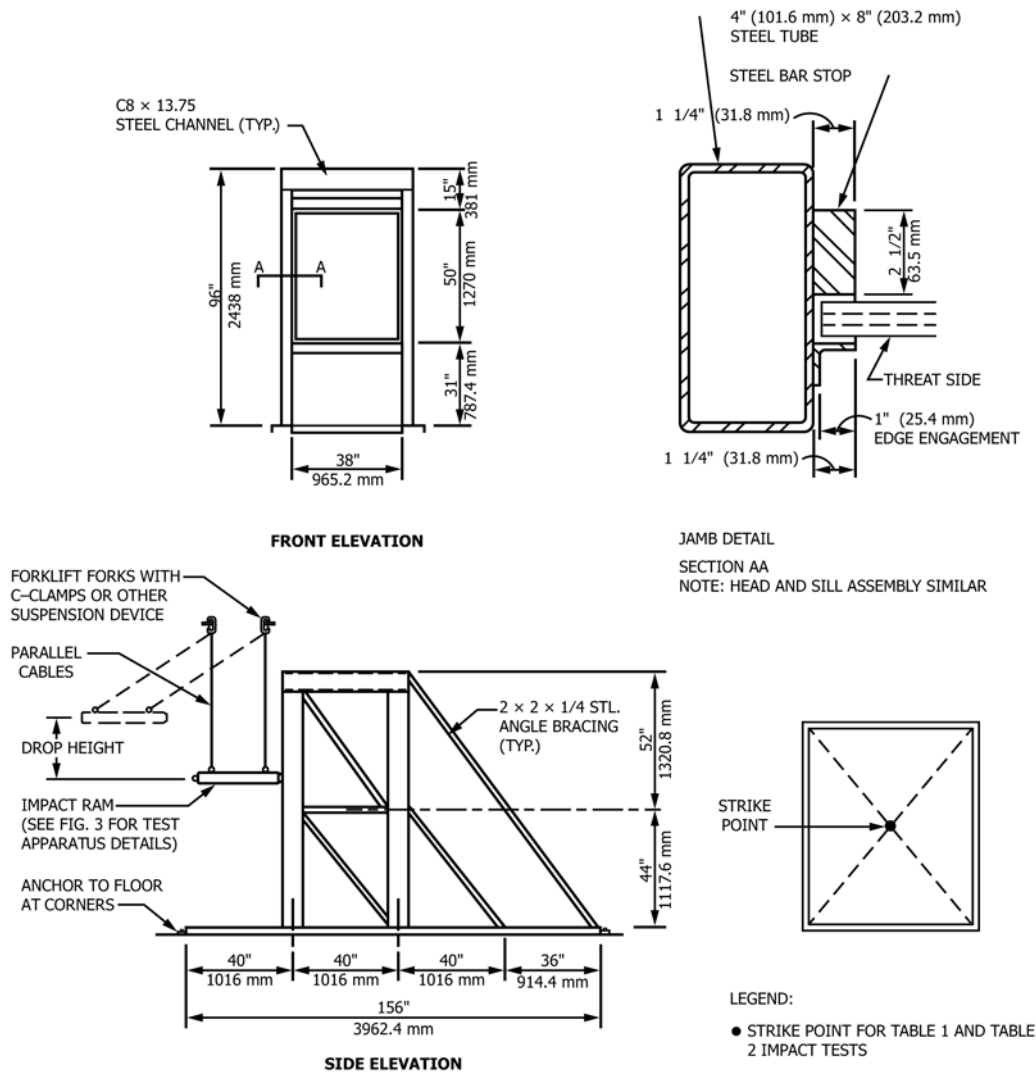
Test Assembly for Detention Glazing Systems and Elevation Location of Impact Strike Point
